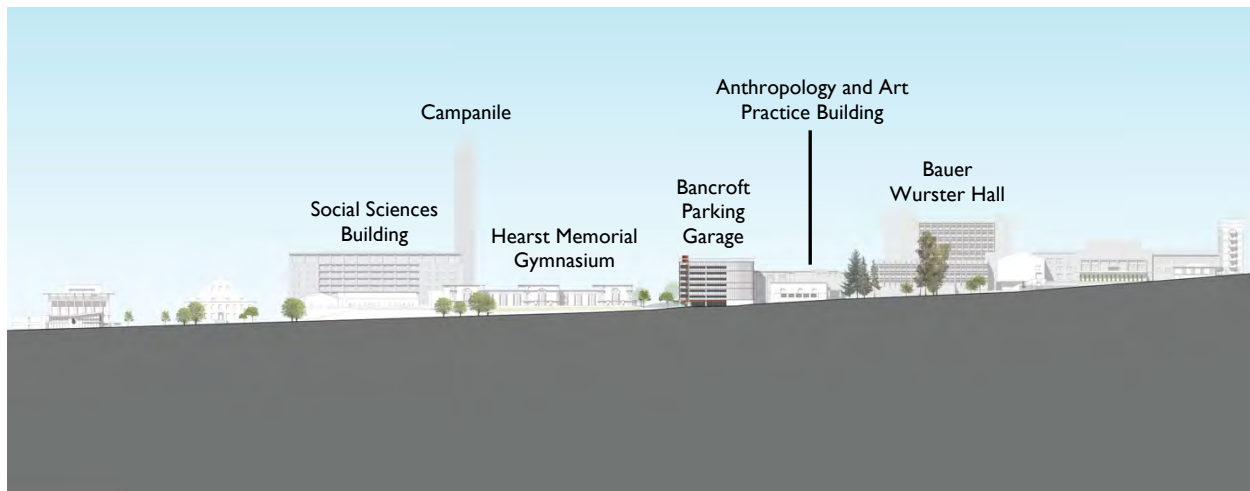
Rendering showing the height, scale, and massing of the proposed parking garage in context with campus buildings along north side of Bancroft Way, view north (UC Berkeley, amended).
